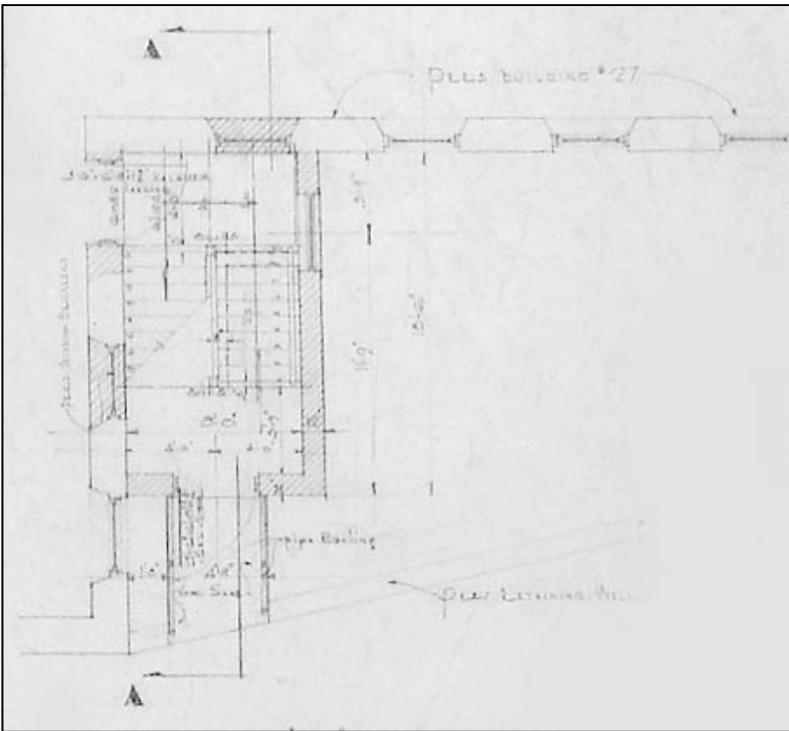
New Stair Tower, Northwest Corner of East Wing, Building #27, Hill Shops, Springfield Armory U.S.A., March 18, 1942; plan detail, not to scale.
